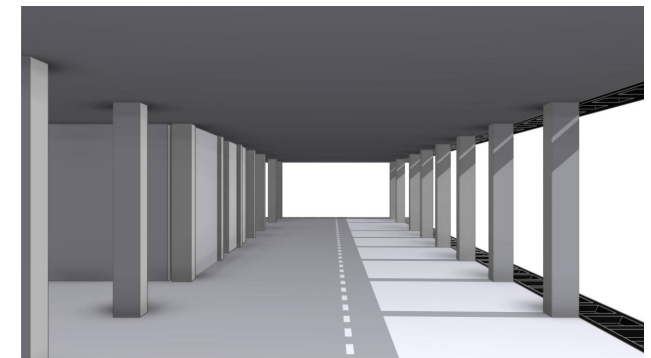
Modeling of typical floor on the winter equinox (by Author)
